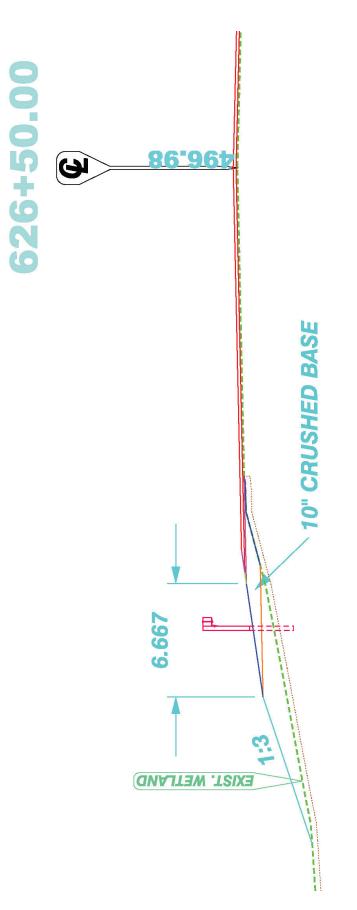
High Tension Cable Guardrail with a 1V:3H Slope Behind
